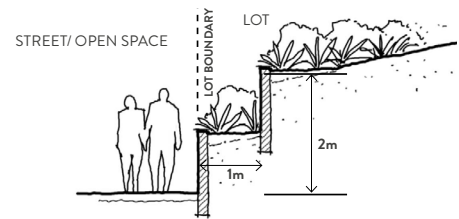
| Retaining Wall: Street/ Open Space Interface [Alternate]
